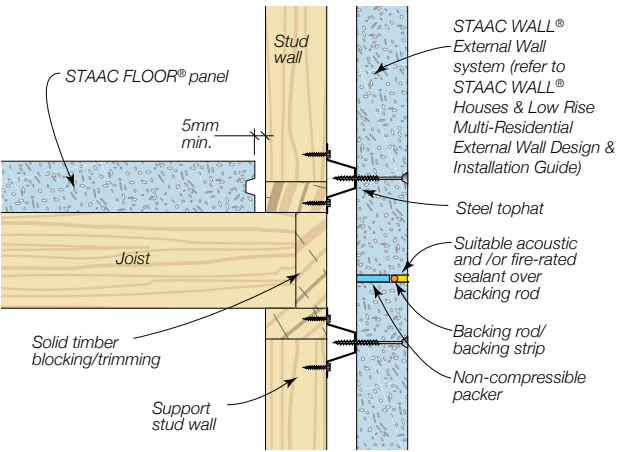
Platform Flooring with External Loadbearing Wall
